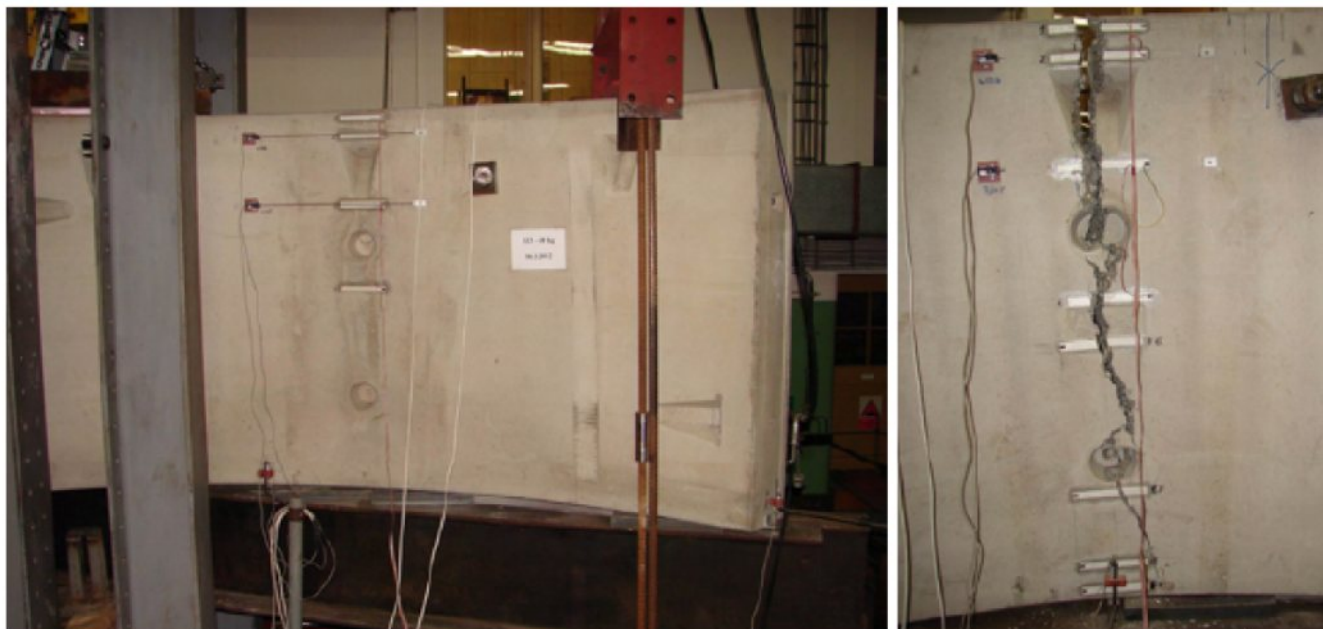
Compression of a non-uniformly supported segment (left: segment installed in the test machine; right: detail of the fractured segment).
